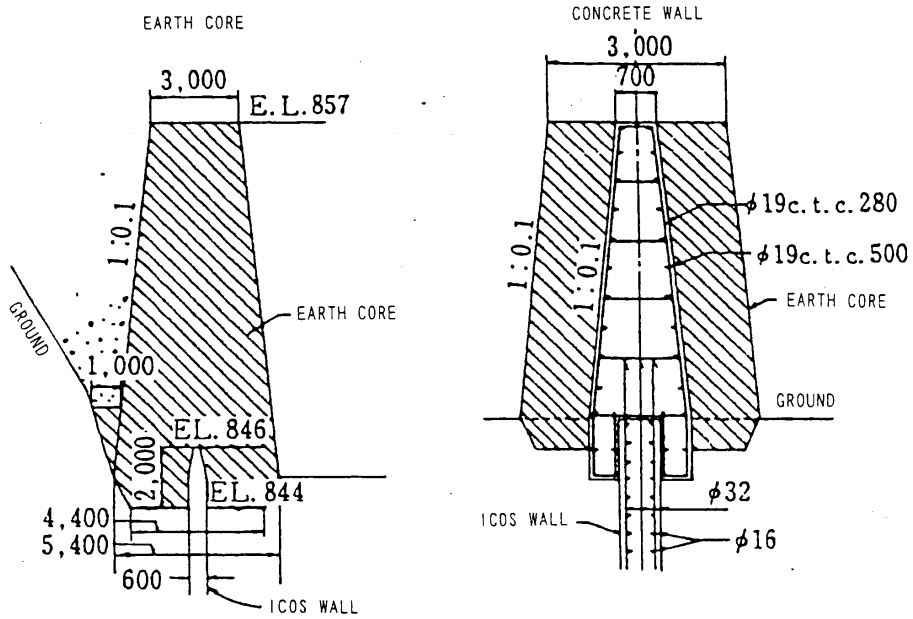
Two types of cores connected to the ICOS wall. Left: Full clay core with ICOS wall penetrating by 2 m. Right: Core consisting of concrete wall embedded in clay. ICOS wall is connected to concrete wall.
